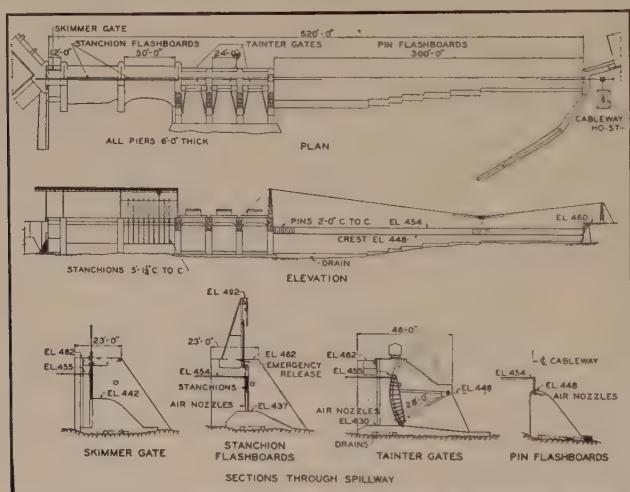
SPILLWAY AND GATES PLAN, ELEVATIONS AND SECTIONS
